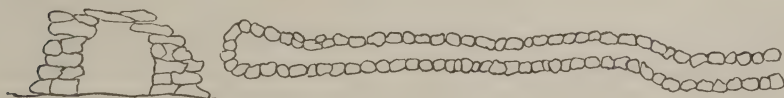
Underground Building at Safester (Section and Ground-plan).
